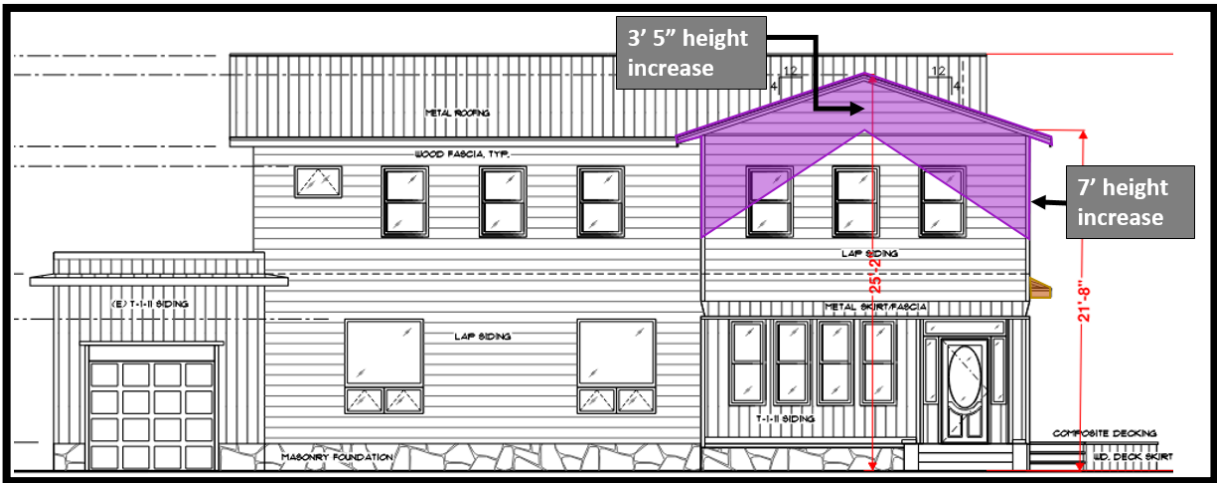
Figure C - View of Front Elevation from Teller Street – Proposed Encroachments
